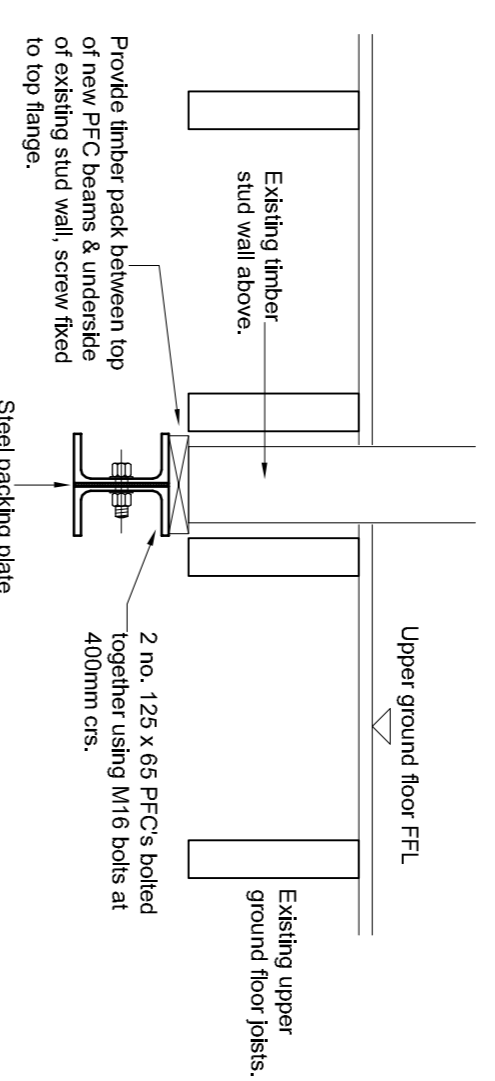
DETAIL OF SPREADER BEAM AT ENDS OF BEAM G1 (1:10)
